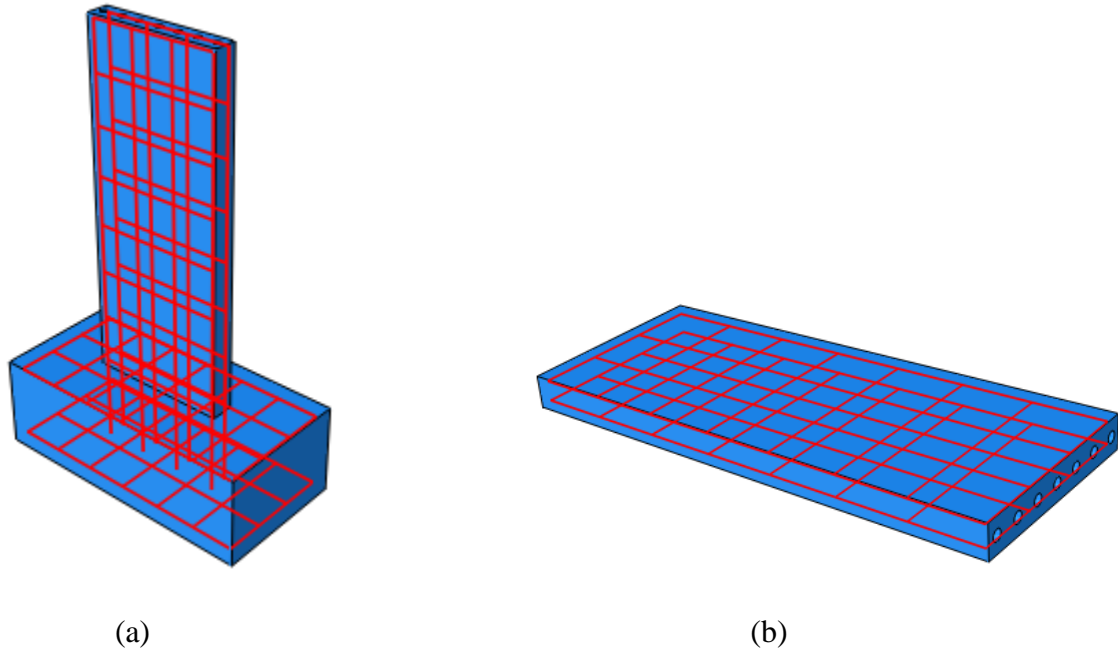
(a). FE Model of Wall with Footing; (b). FE Model of Wall without Footing
